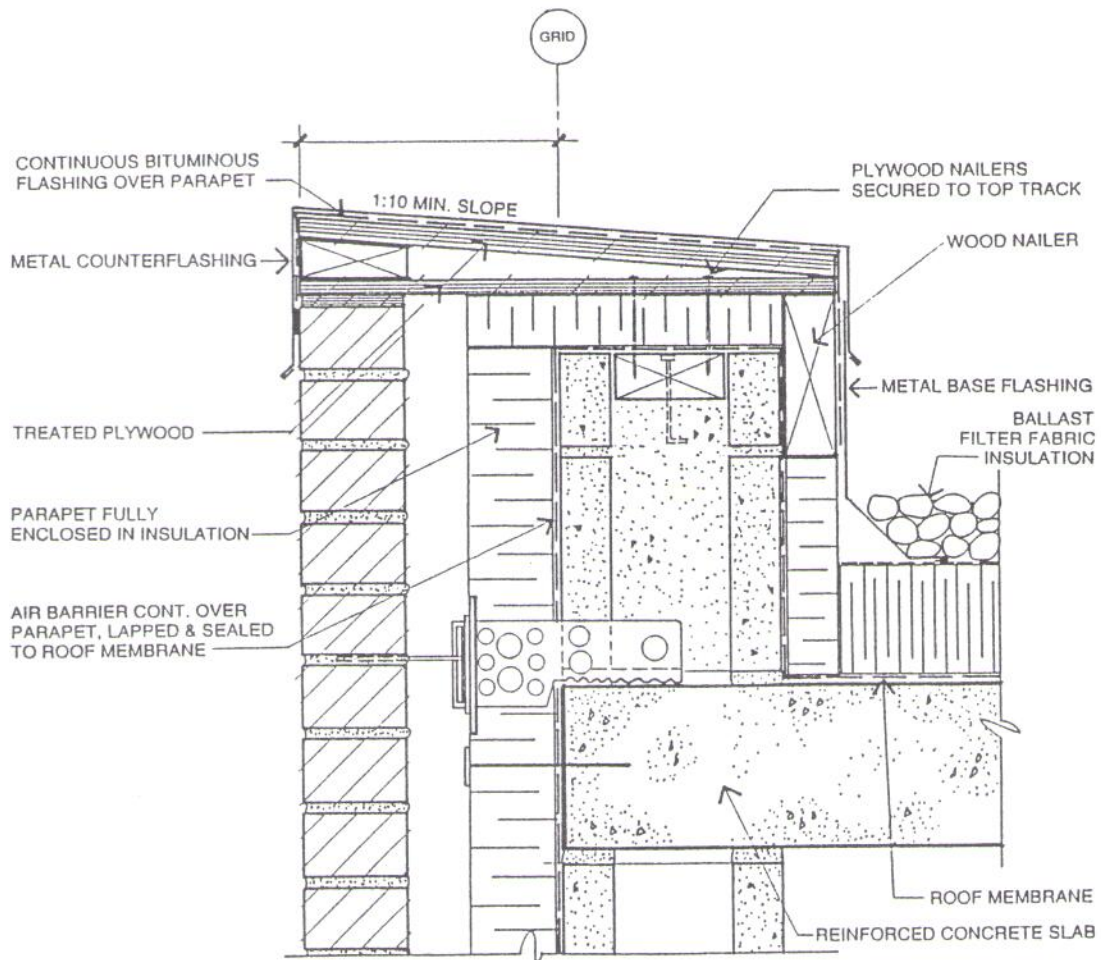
Brick Veneer/Concrete Block Detail At Low Parapet
